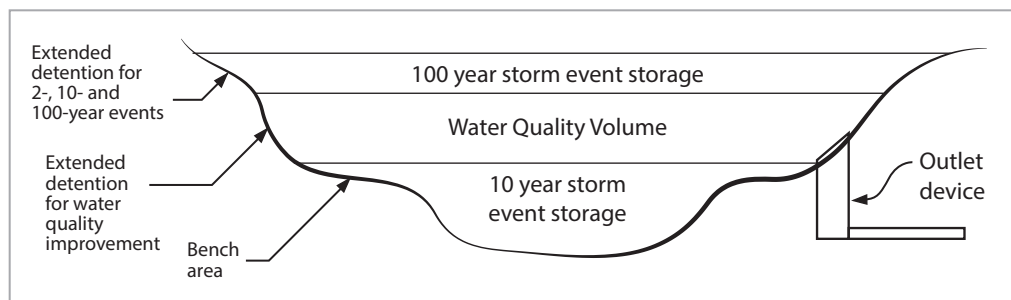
Cross sectional design of a typical stormwater storage pond (from Pitt 1996).
